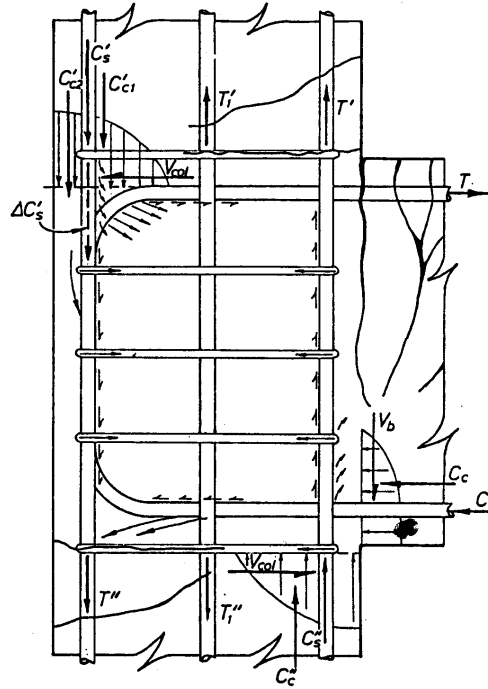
6: Bond stresses transfer mechanism for exterior beam-column joint from [46]
